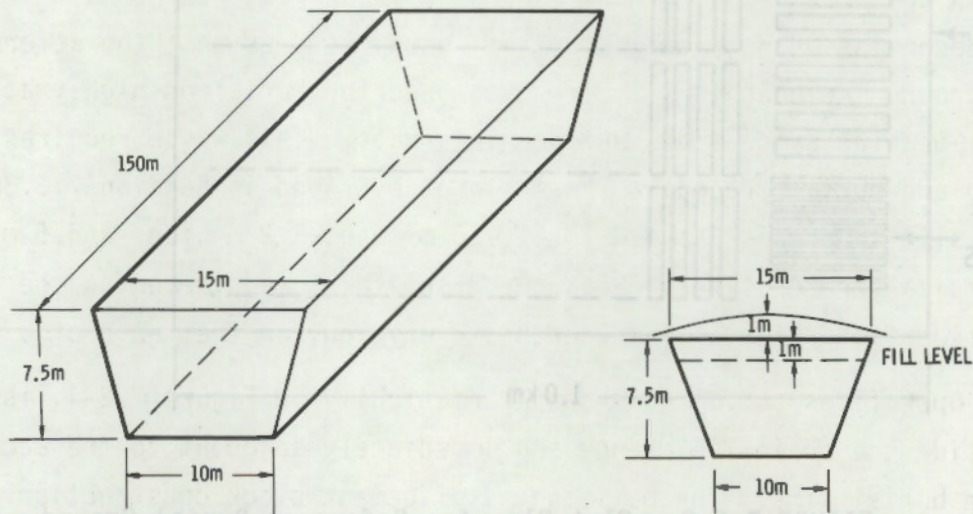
Typical Low-Level Waste Burial Trench
